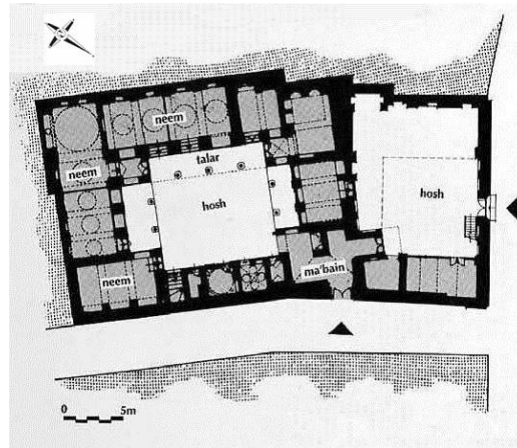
Ground floor plan in Baghdad courtyard house (Warren & Fethi 1982)
